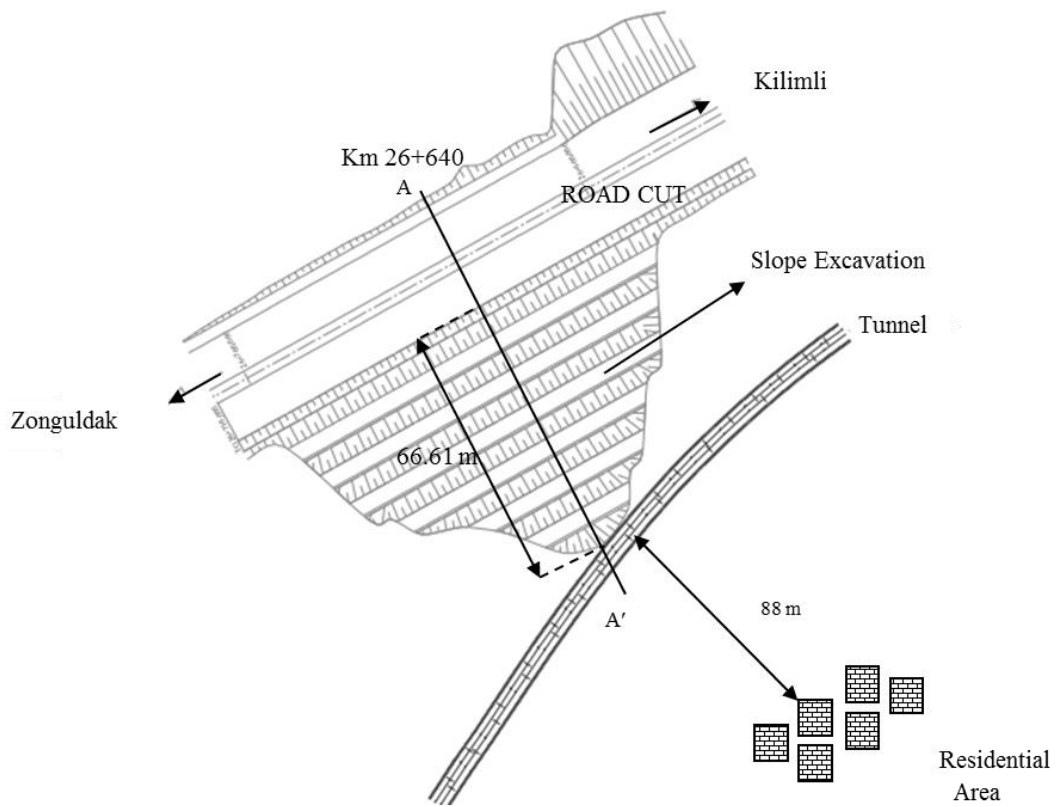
Plan view of the tunnel of the critical Km 26+640 section (A-A').
